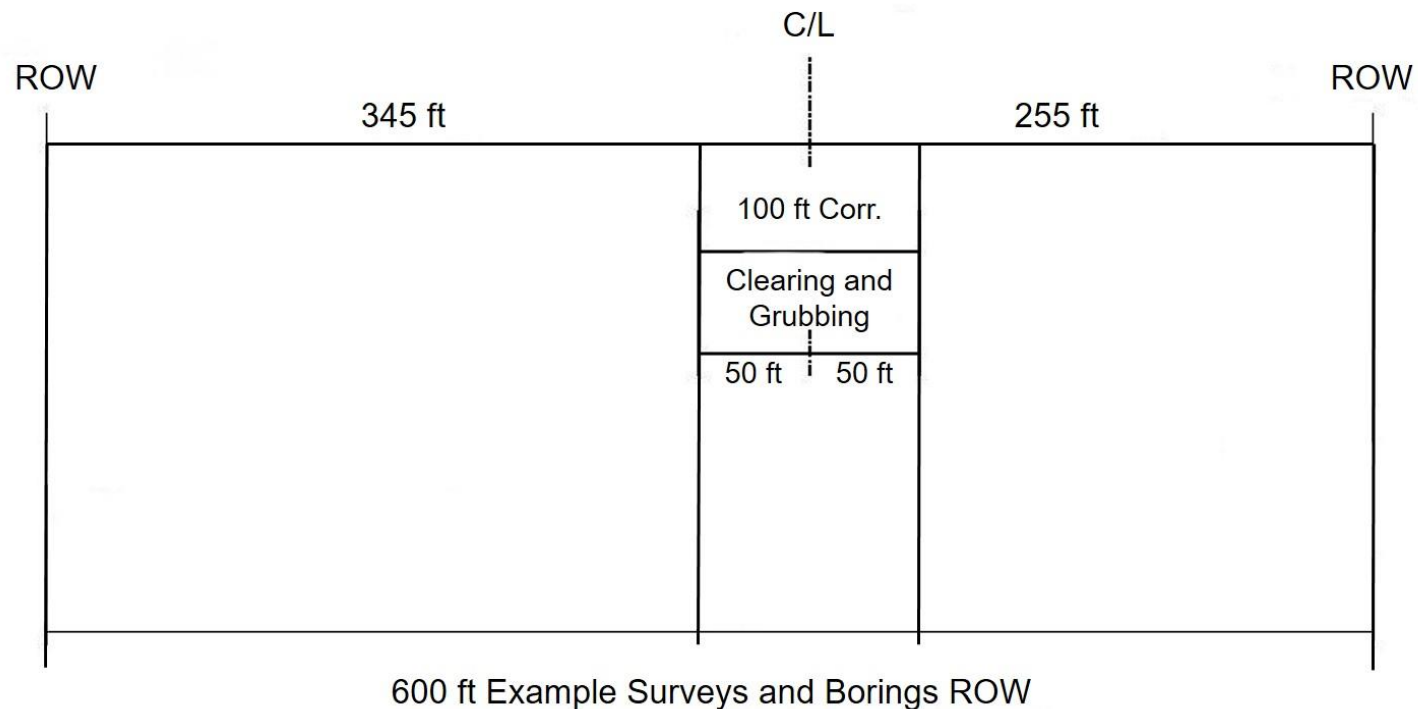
Plan view drawing of a typical ROW for the Proposed Action.
